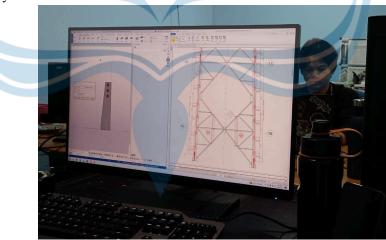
Building Information Modelling of Tower Structure using BIM Tekla Structure
